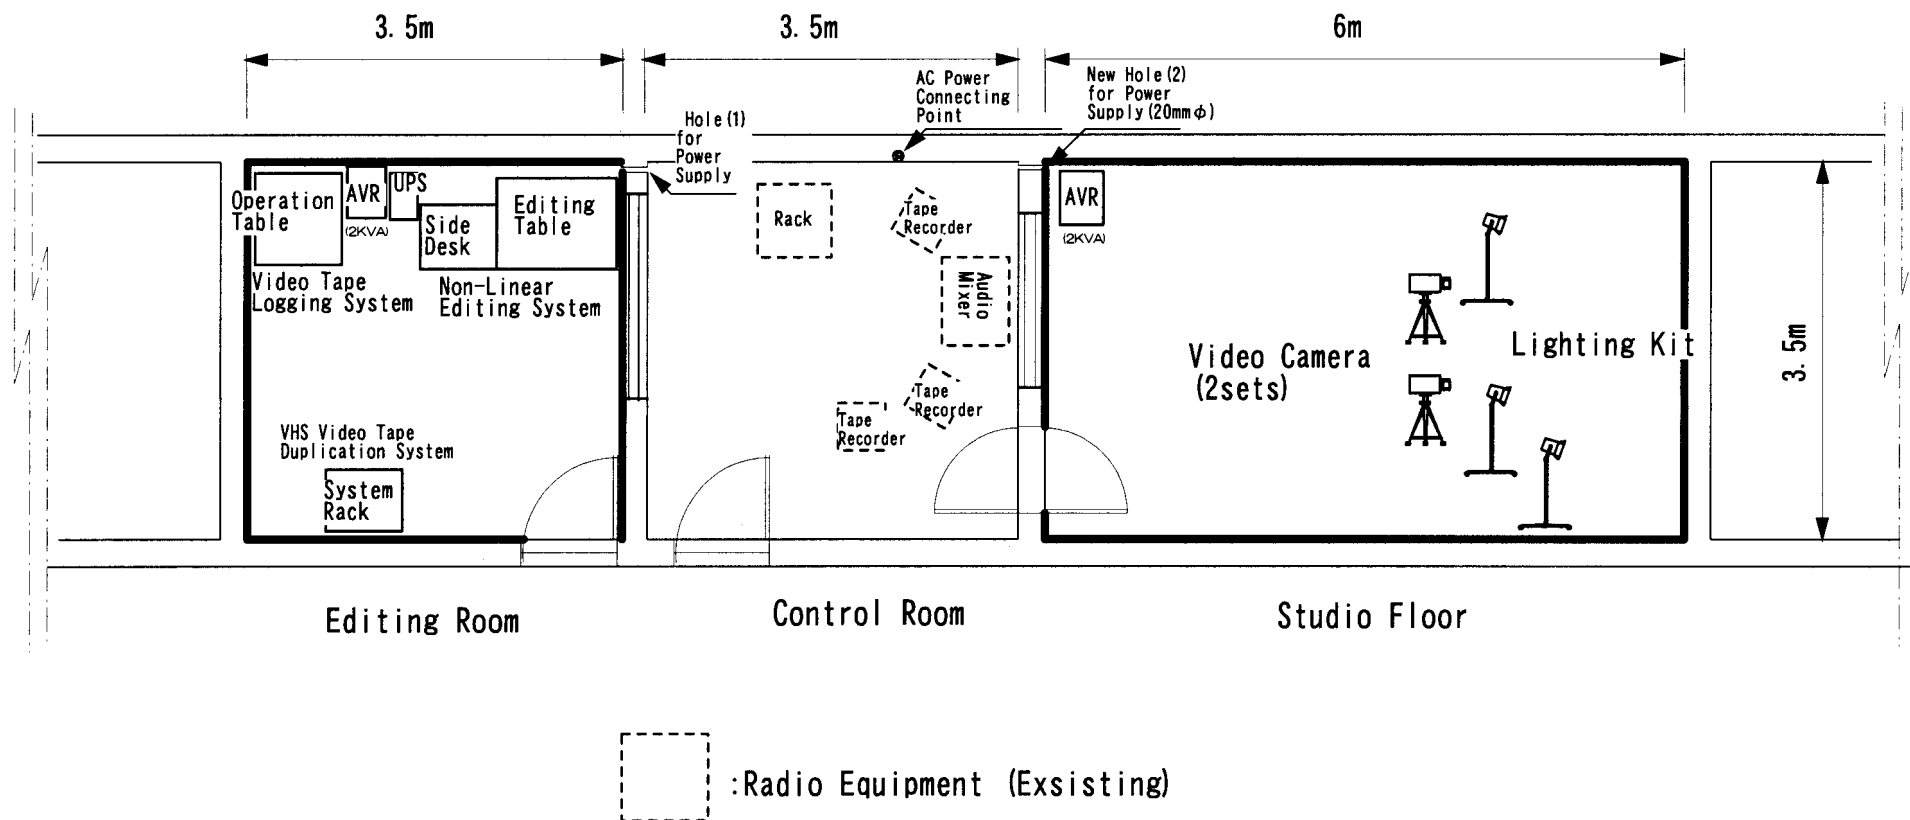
Floor Layout of Mekelle TV Studio
